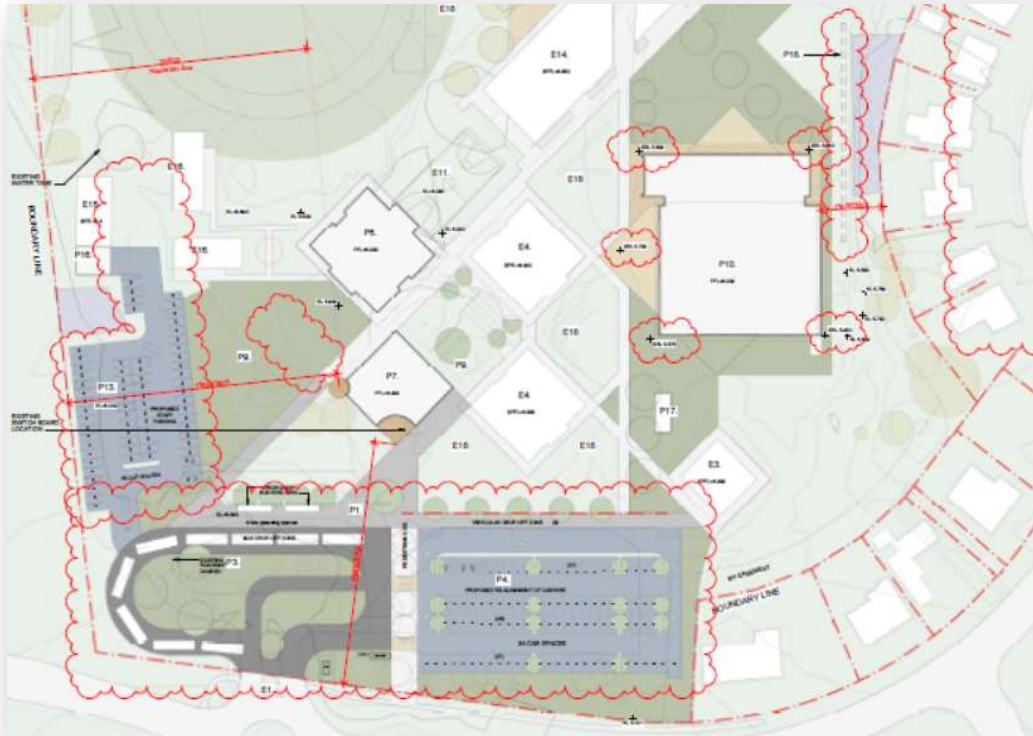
Extract from Front of Campus Site Plan (Drawing DA-11-21). The Sports and Recreation Centre (P10) is the large white building to the upper right (Source: Cox Architecture 2023)
